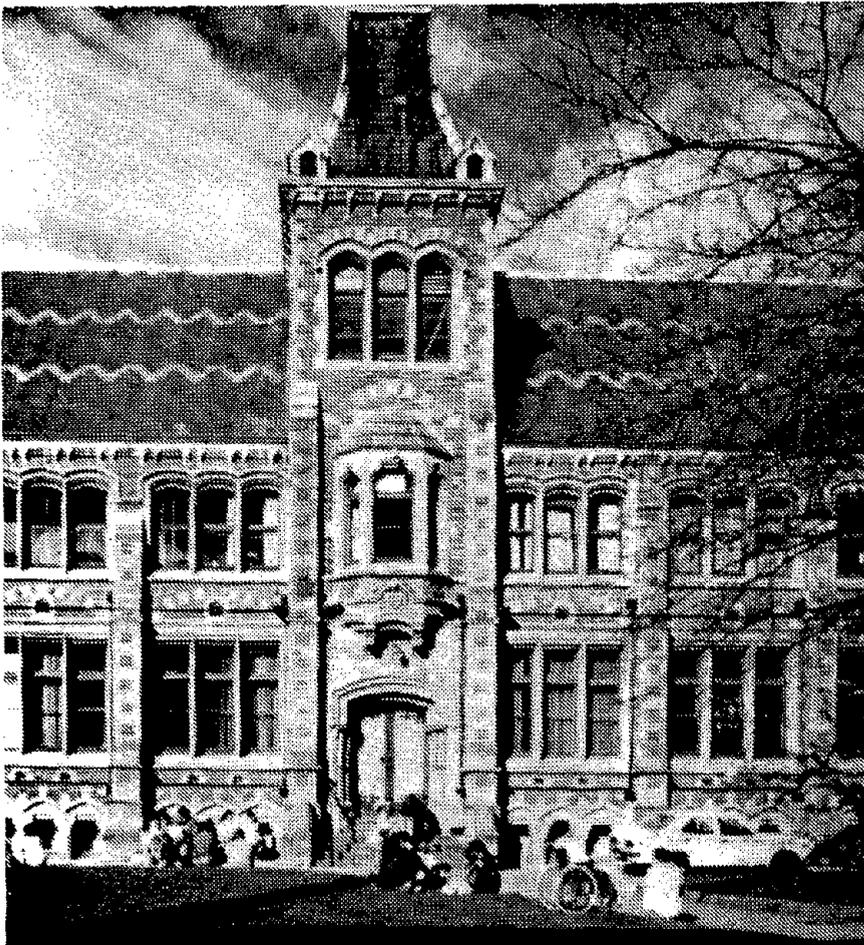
A UNIVERSITY BUILDING IN CHRISTCHURCH, NEW ZEALAND. Steel tension cables have been wrapped around the structure to reinforce it.
